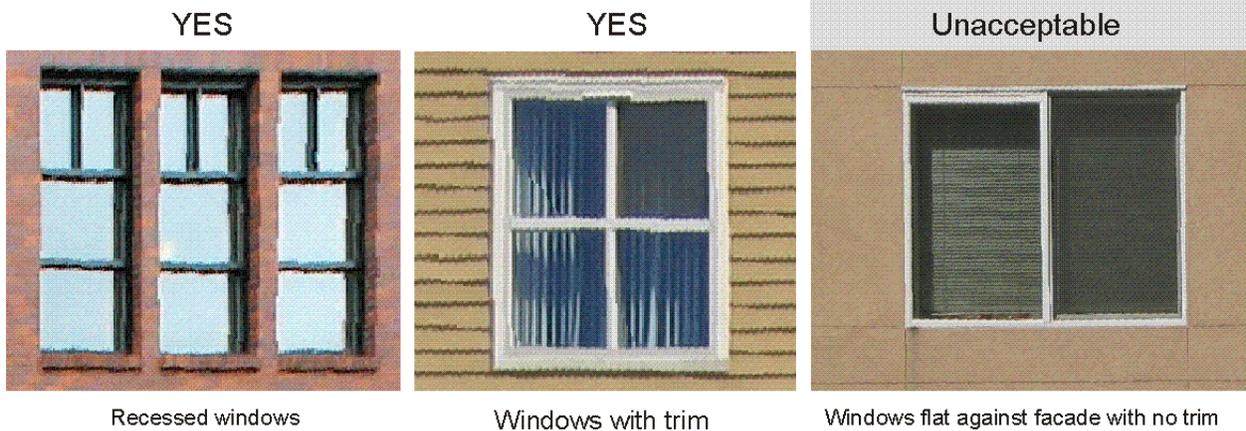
B.30.320b. Acceptable and unacceptable window design examples.
